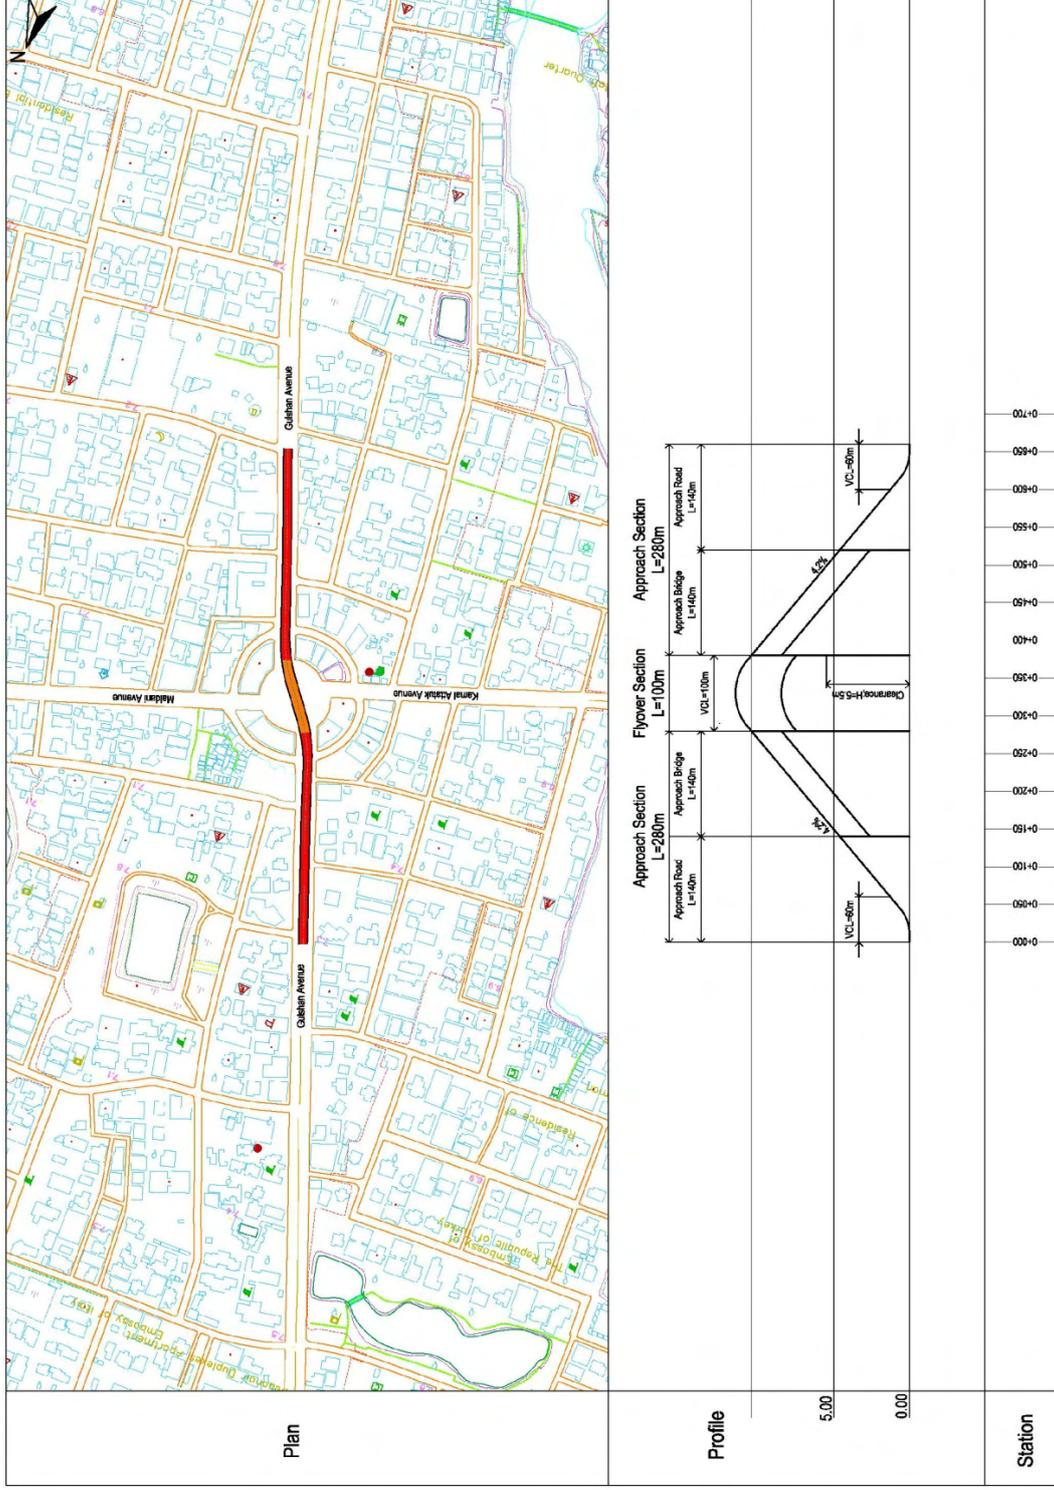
Layout Plan and Profile of Gulshan-2 Flyover Plan
